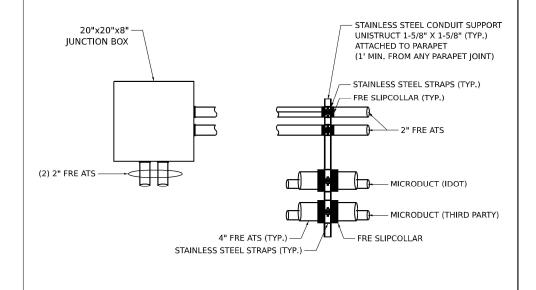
WB OVER JOLIET JUNCTION TRAIL BRIDGE PARAPET CROSS SECTION
